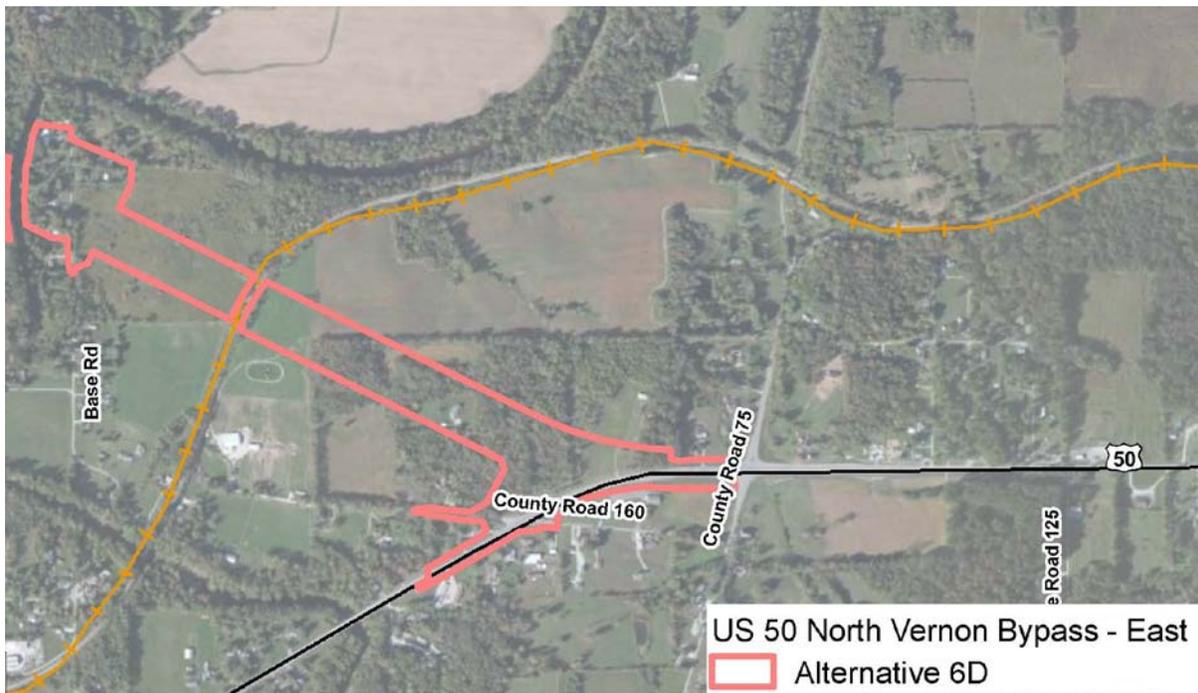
ALTERNATIVE 6D CONNECTION TO U.S. 50
